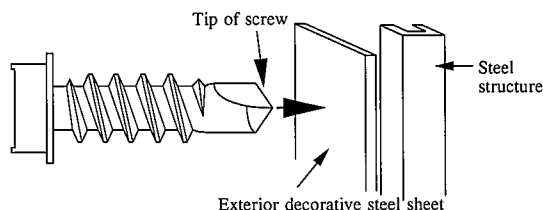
(b) Fastening method with self-drilling and -tapping screw
